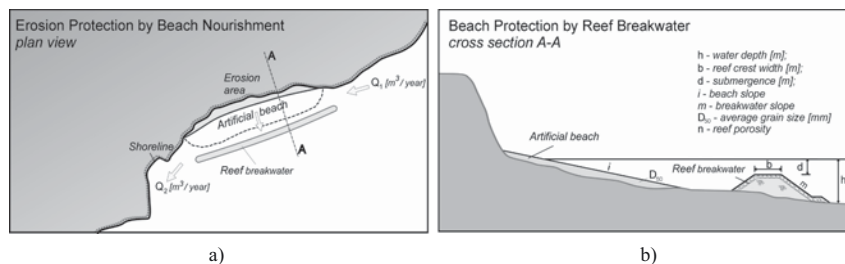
Example sketch of application of reef breakwaters; a) plan view; b) cross-section
